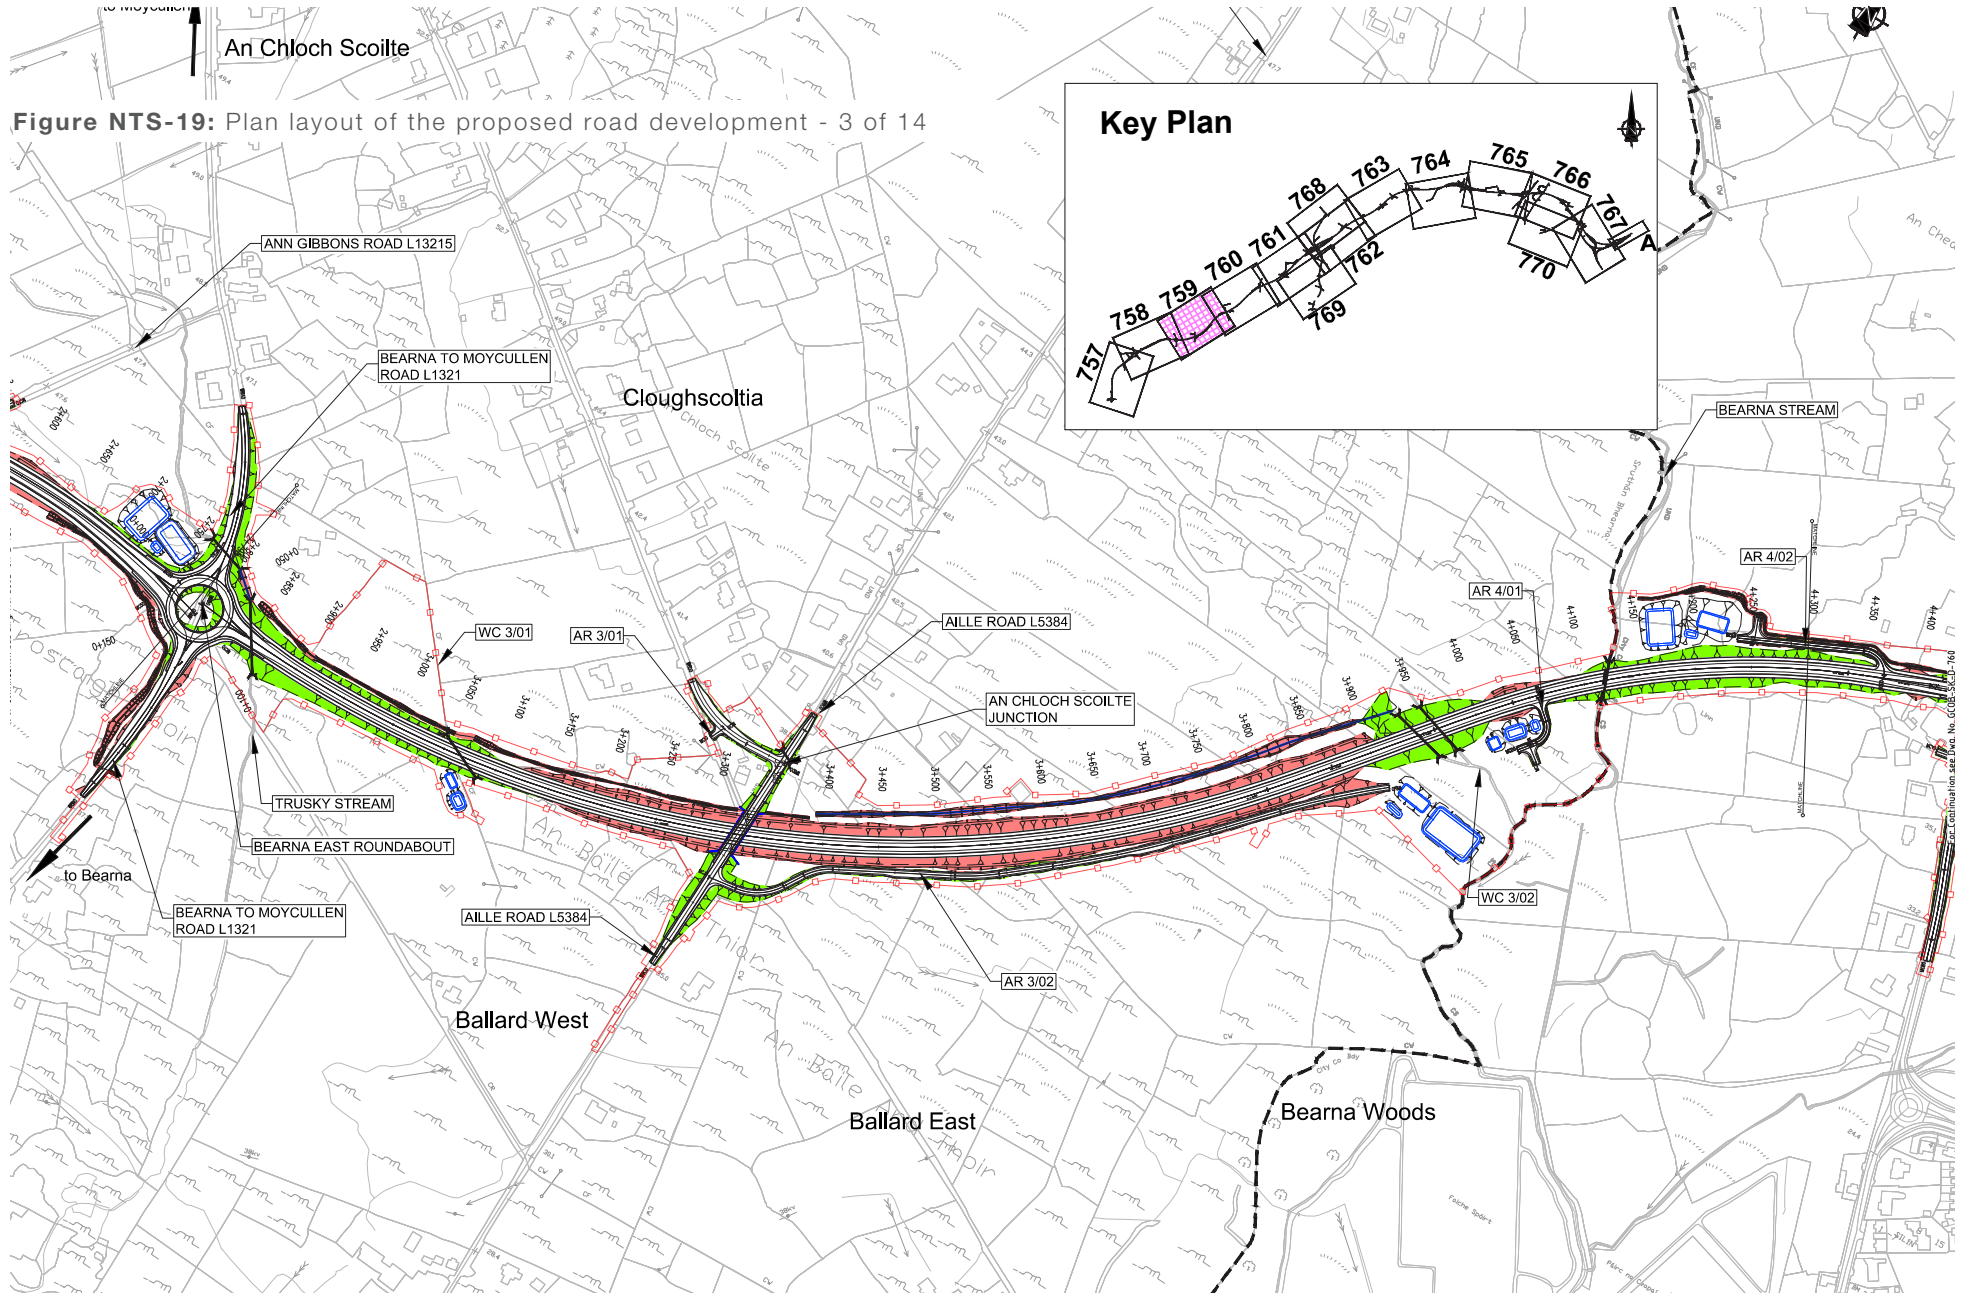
Plan layout of the proposed road development - 3 of 14
